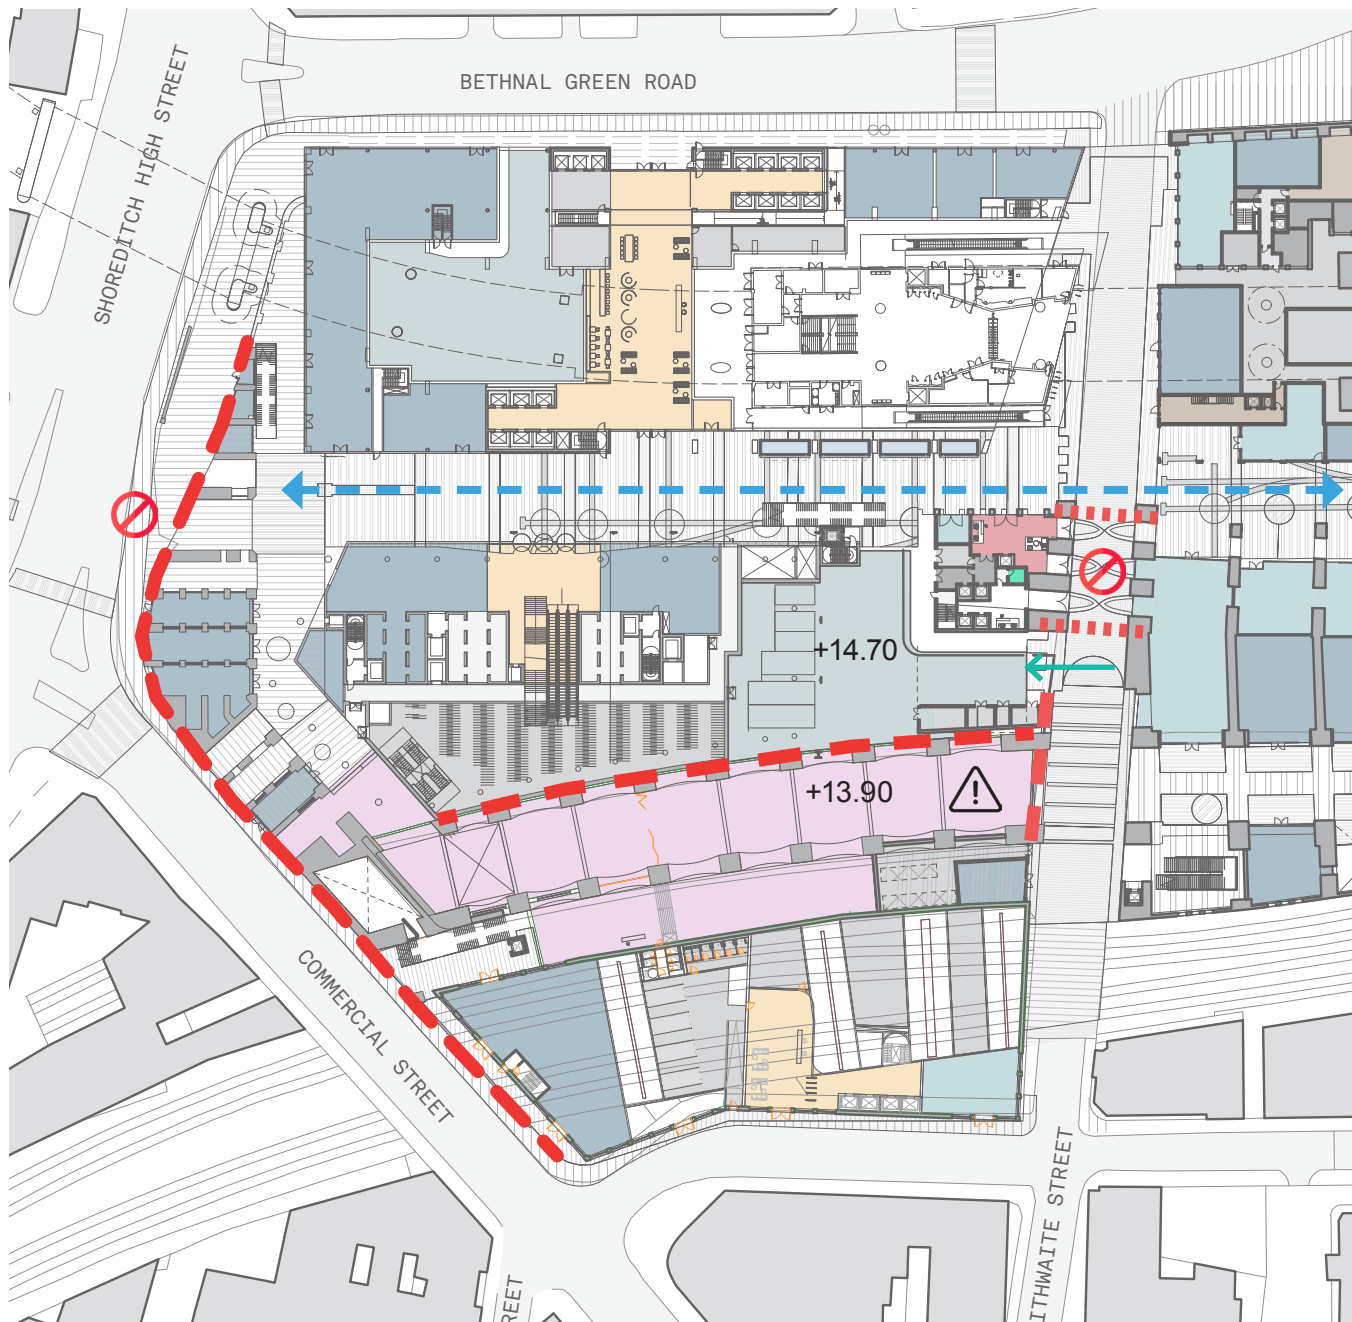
Plan diagram showing restrictions to access for serving arrangement
